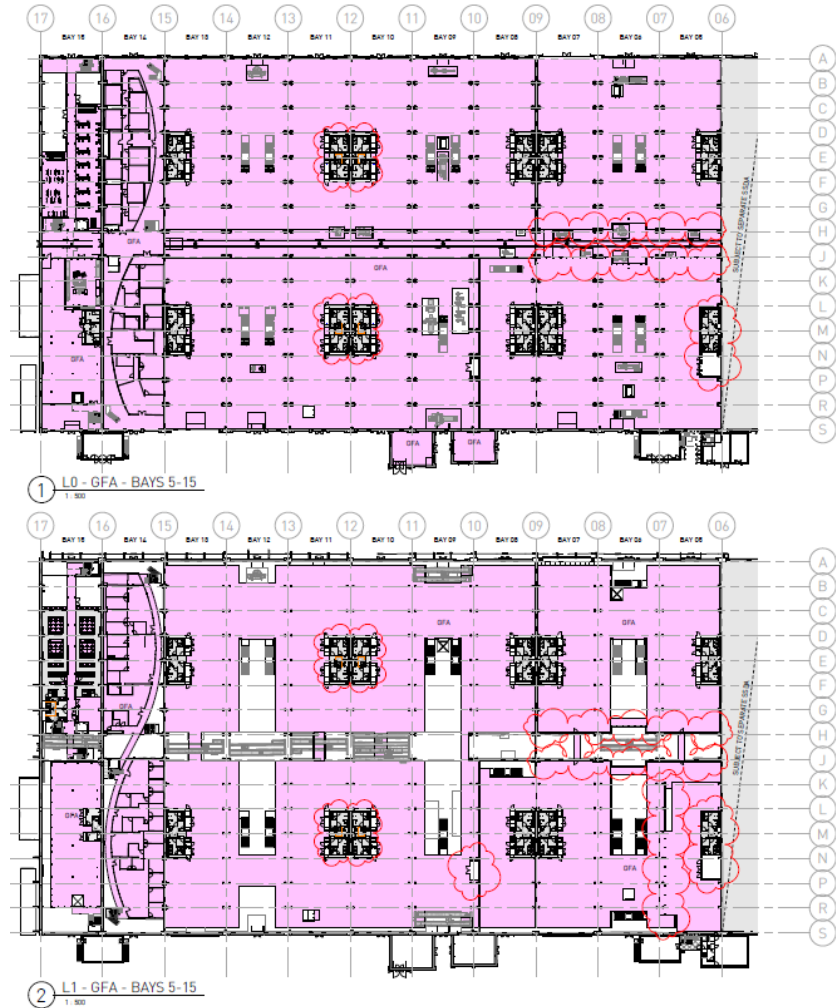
Proposed GFA Ground and First Floor Plans (Source: Sissons, 2020)
